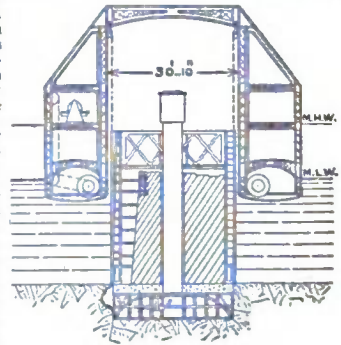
Antwerp Quay Wall, founded by compressed air.
